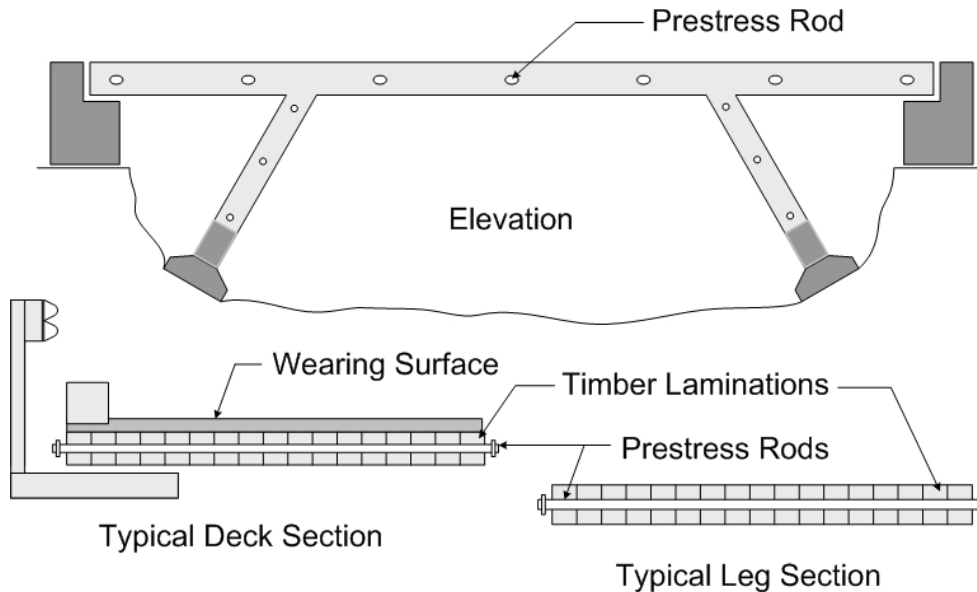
Stress-Laminated Timber K-frame Bridge
